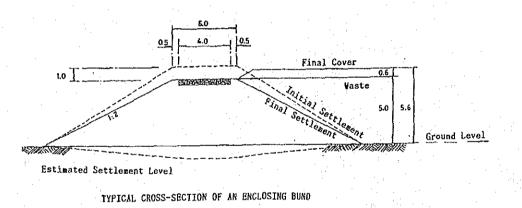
Typical Cross Section of Enclosing Bund
